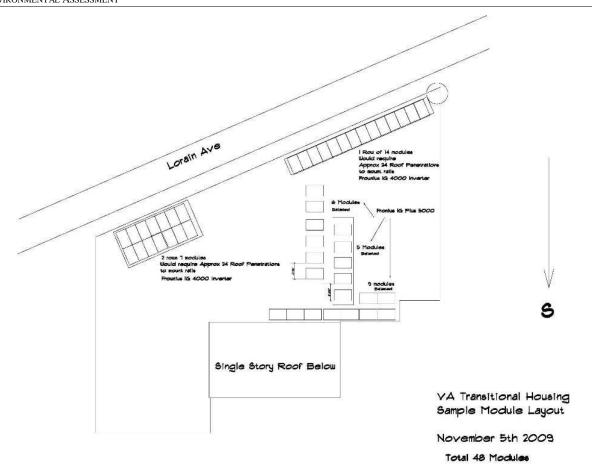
Proposed Solar PV Installation Layout on the VA TR House Roof.
